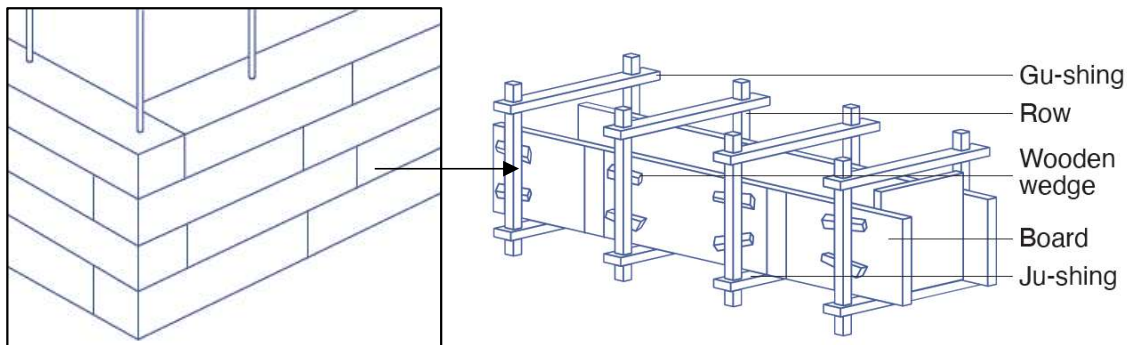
Rammed earth wall block arrangement (staggered pattern)
